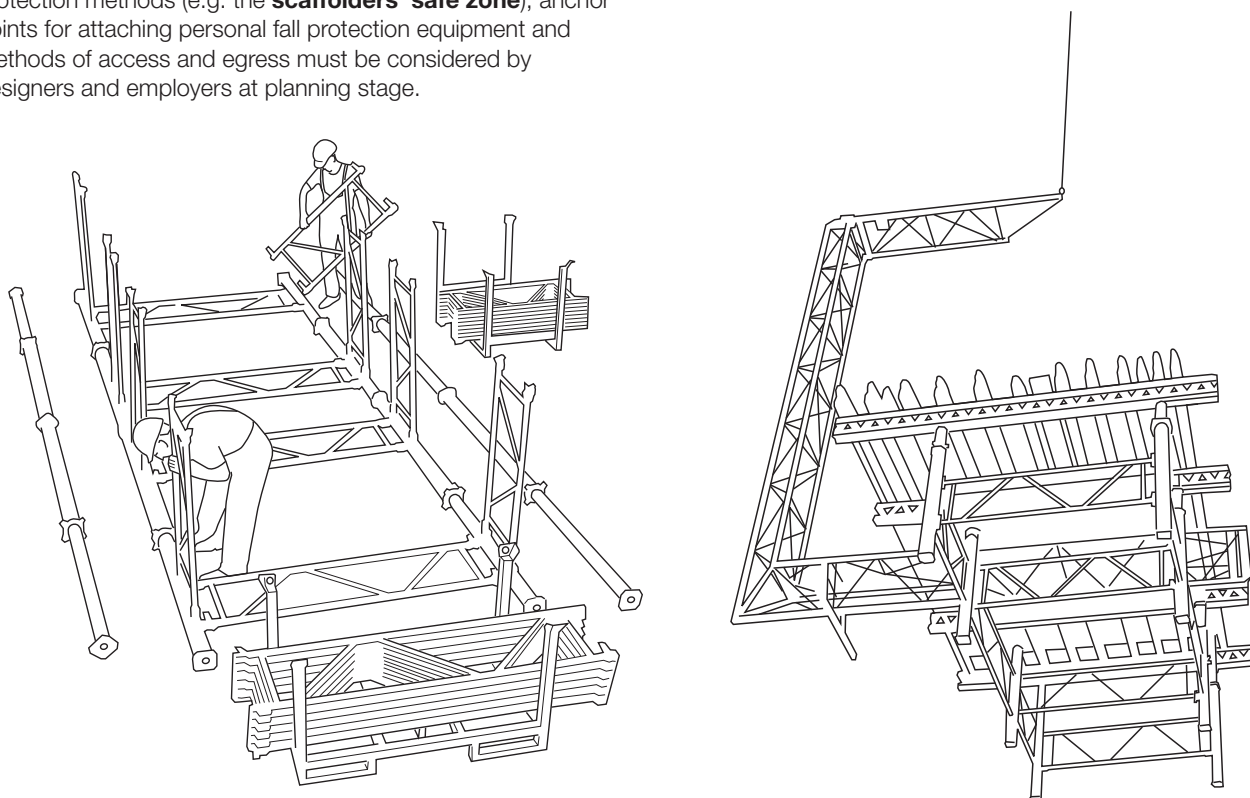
Formwork system erected on the ground or slab and lifted into position to avoid the need to work at height.
